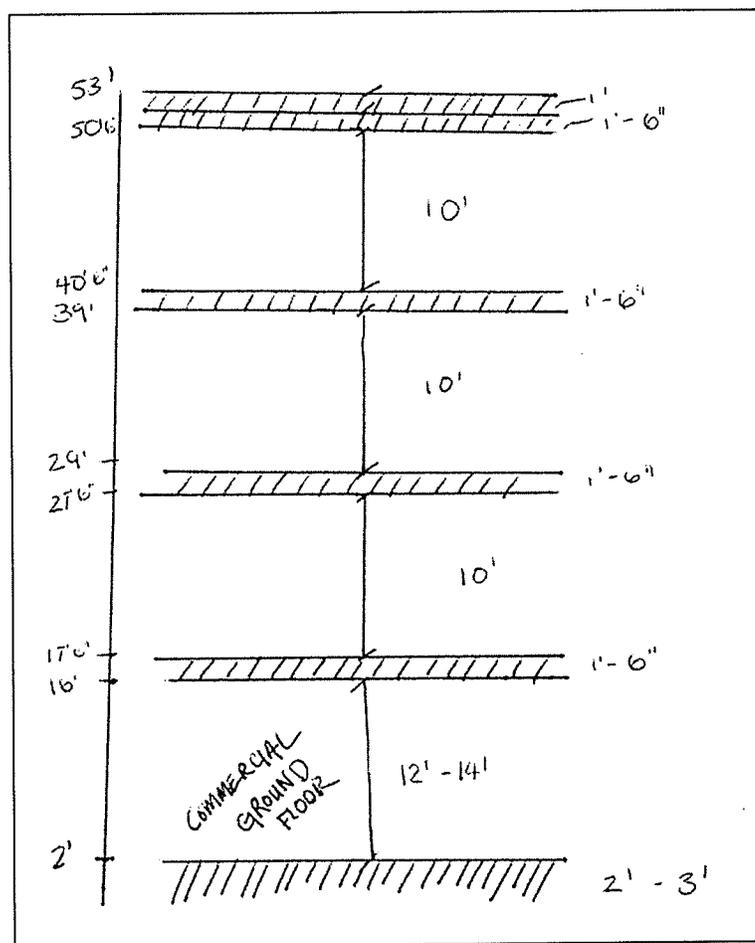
A typical four-story development usually exceeds 50 feet. Taking into account base flood elevation, the inclusion of a parapet, flooring assemblies, as well as a minimum ground floor ceiling height in the range of 12 to 14 feet, a four-story development below 50 feet would substantially reduce the ceiling heights of the residential floors.
